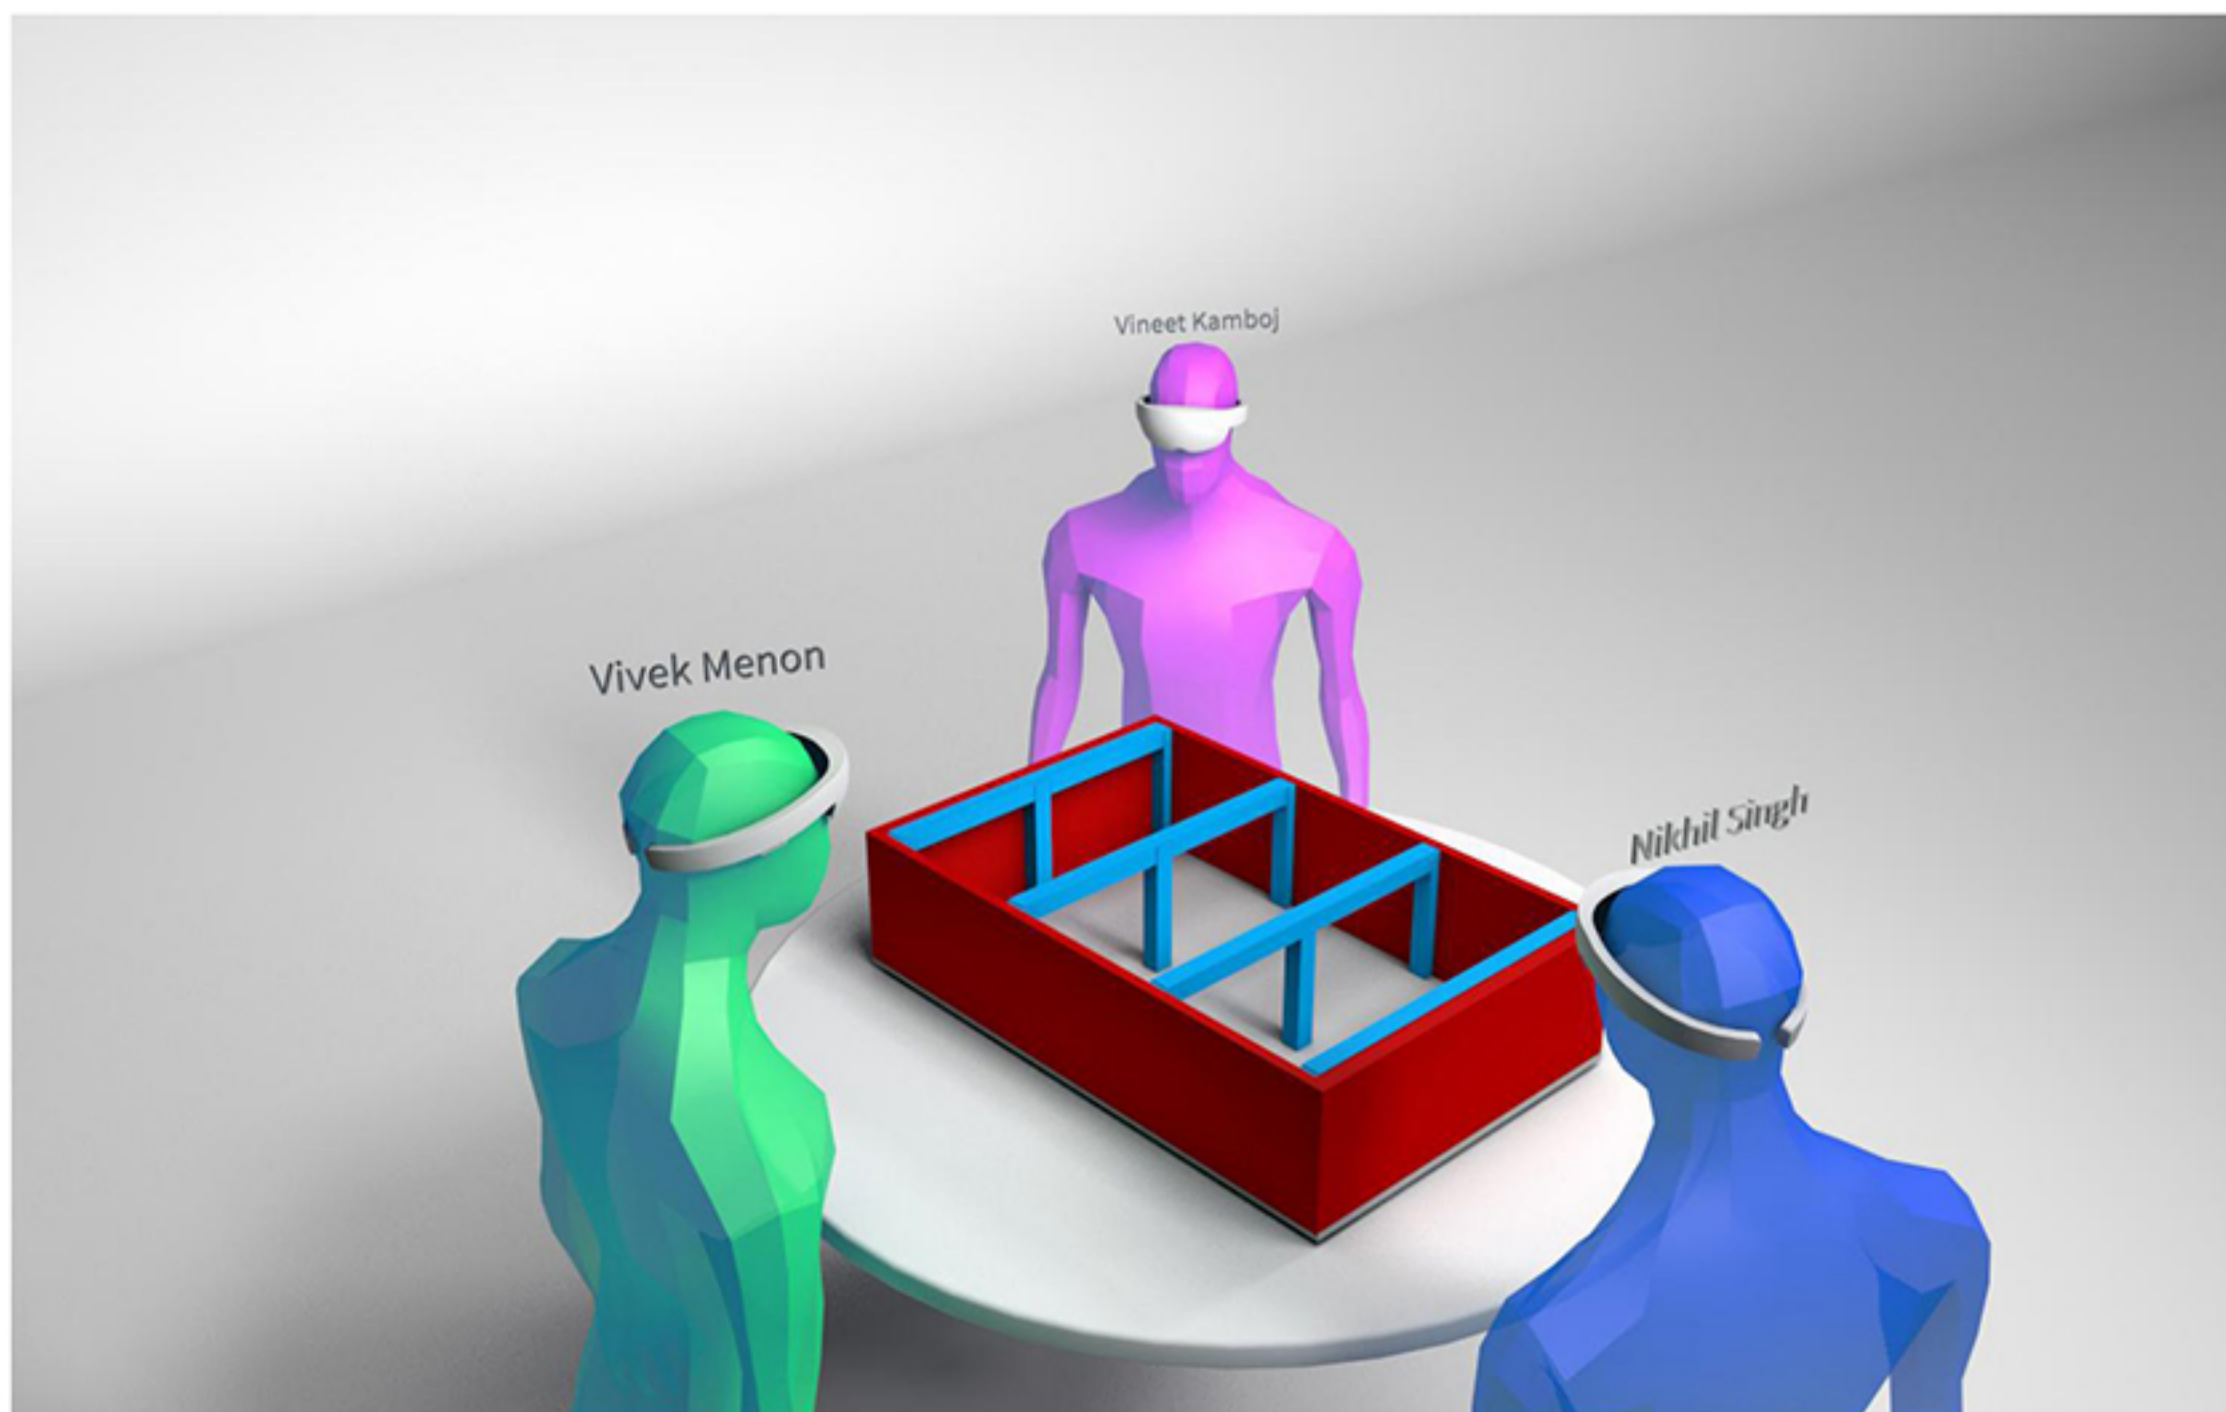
Structural engineer starts adding beams and columns to give structural framework.'
